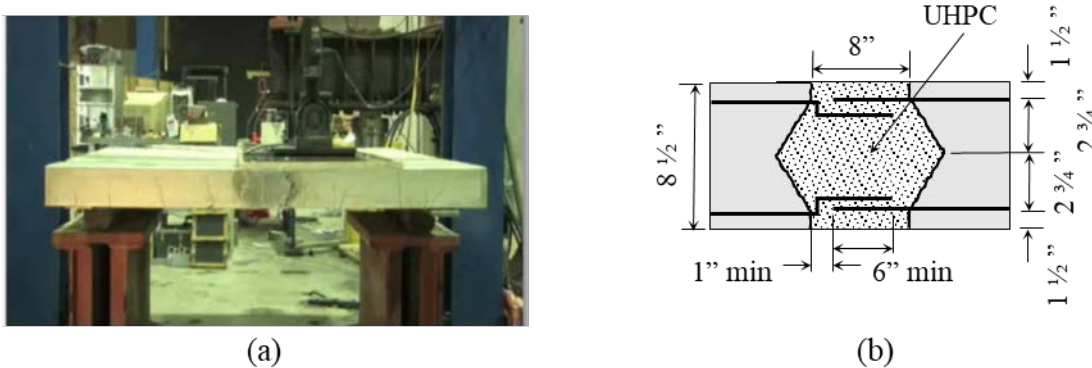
(a) Testing conducted on (b) joint detail between adjacent full-depth precast panels [39]
